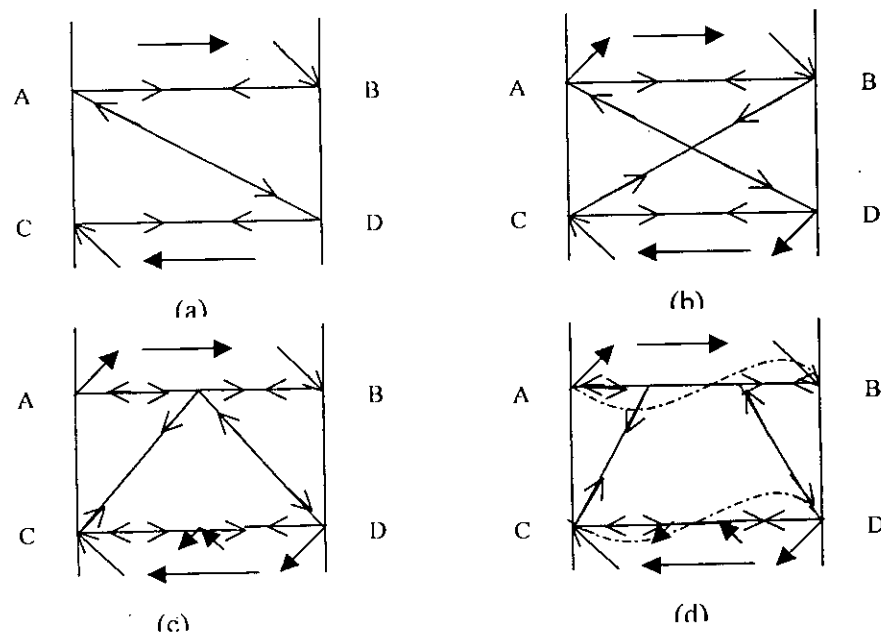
Path of horizontal shear through web members. (a) Single diagonal bracing (b) Double-diagonal bracing (c) K-bracing (d) Story-height Knee bracing.
